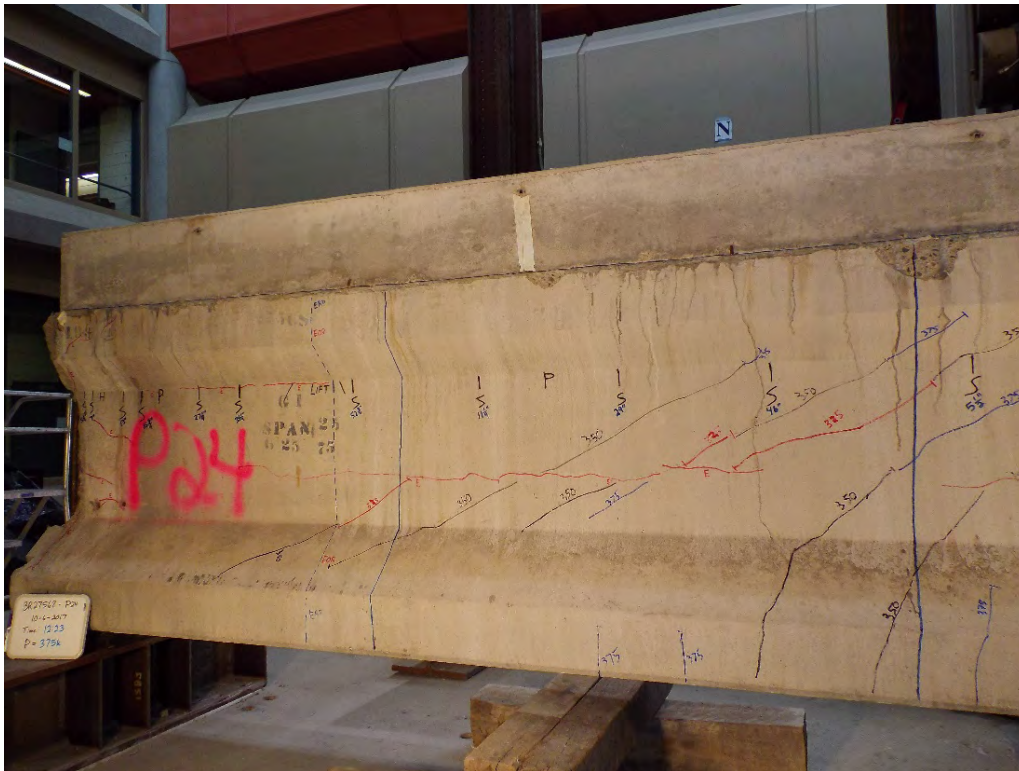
Girder P24 Southside Section 1-Section 2 P=375 kips
